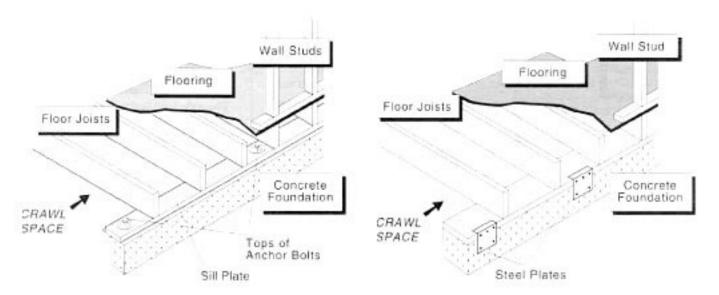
Anchor bolts or steel plates. A home's crawl space may be formed by a cripple wall between the foundation and the floor joists ias illustrated in figure 3, page 5) or the floor joists may rest directly on the sill plate. In either case, you should be able to see the heads of anchor bolts or steel plates installed every 4 to 6 feet (not necessarily exactly as shown here). These fixtures fasten the sill plate to the foundation.
